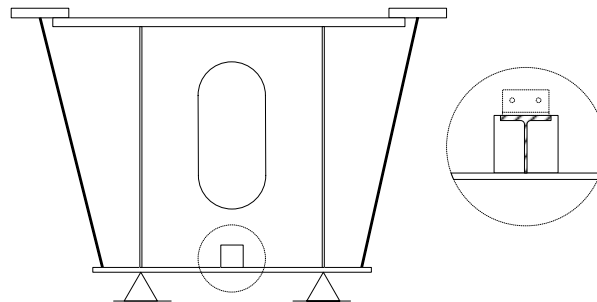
Longitudinal Flange Stiffener Detail at Internal Diaphragm
